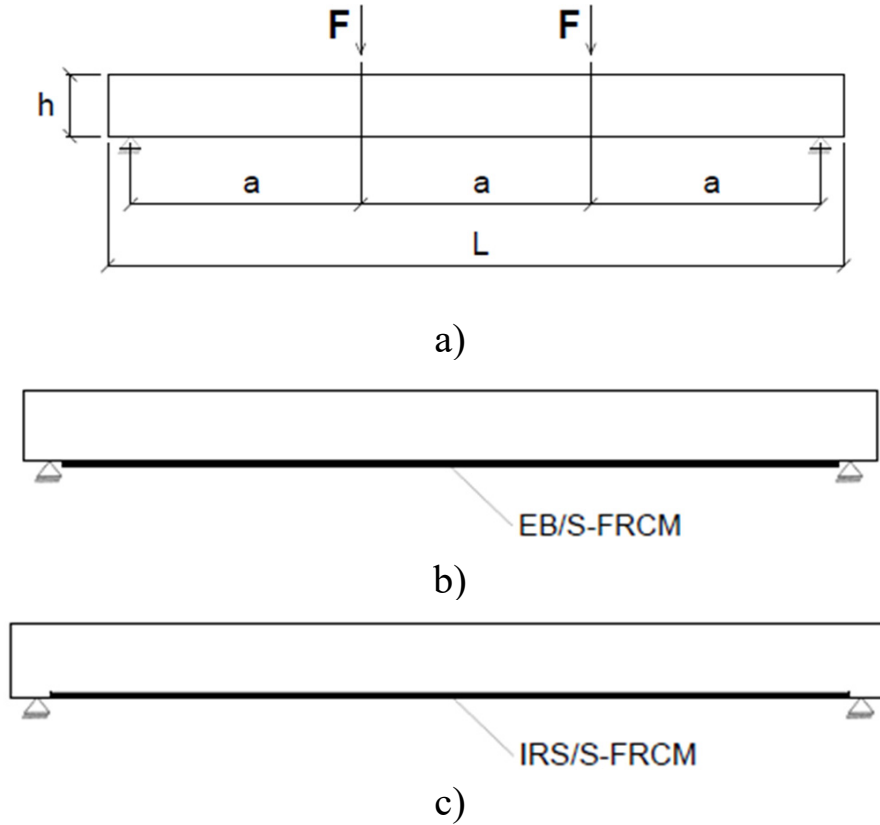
Geometry of control and strengthened beams: a) RC control beam; b) EB technique and c) IRS technique.
